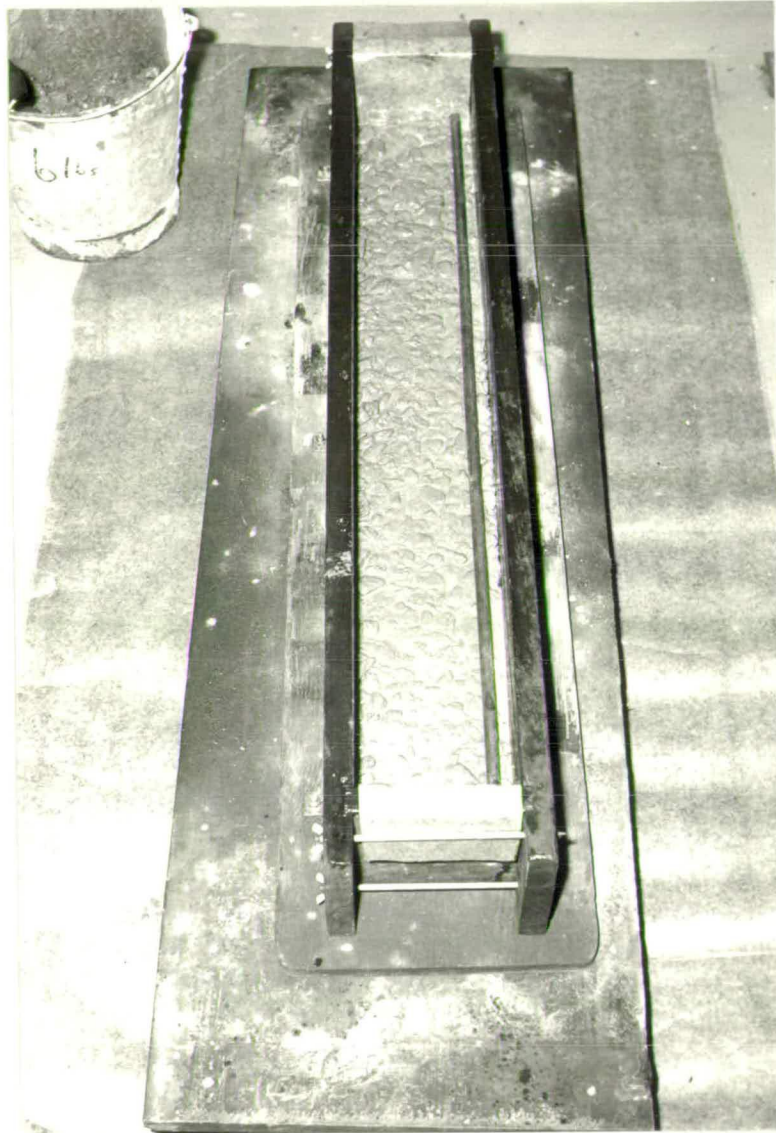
First layer cast, vibrated, leveled & steel bar placed.
